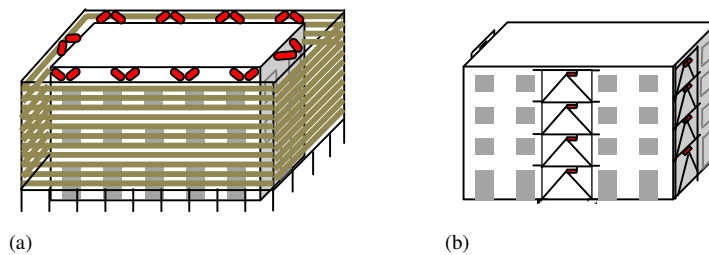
External alternative FVDs configurations: (a) inserted into a ventilated facade, (b) installed within planar bracing connected to the building
